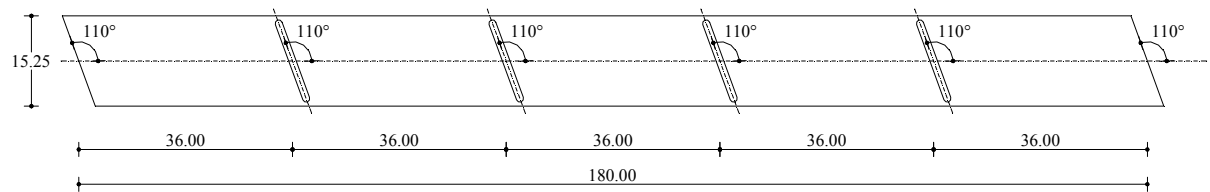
Inclination of pier in Kosynthos bridge with respect to the geometric longitudinal axis (Plan View)
